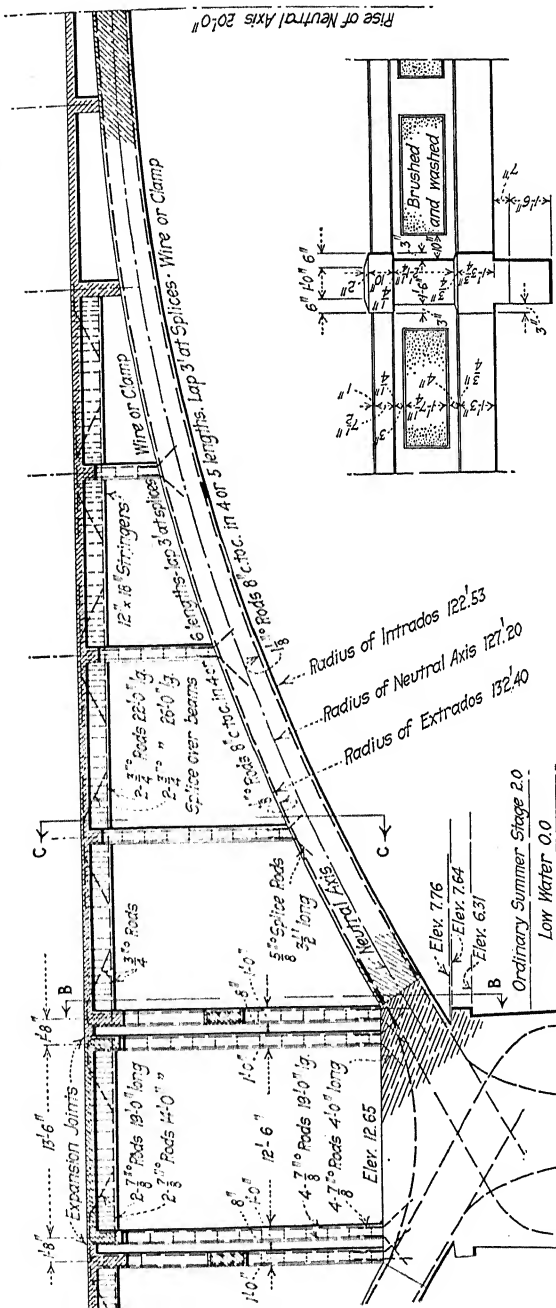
Chippewa River bridge, Eau Claire, Wis.
